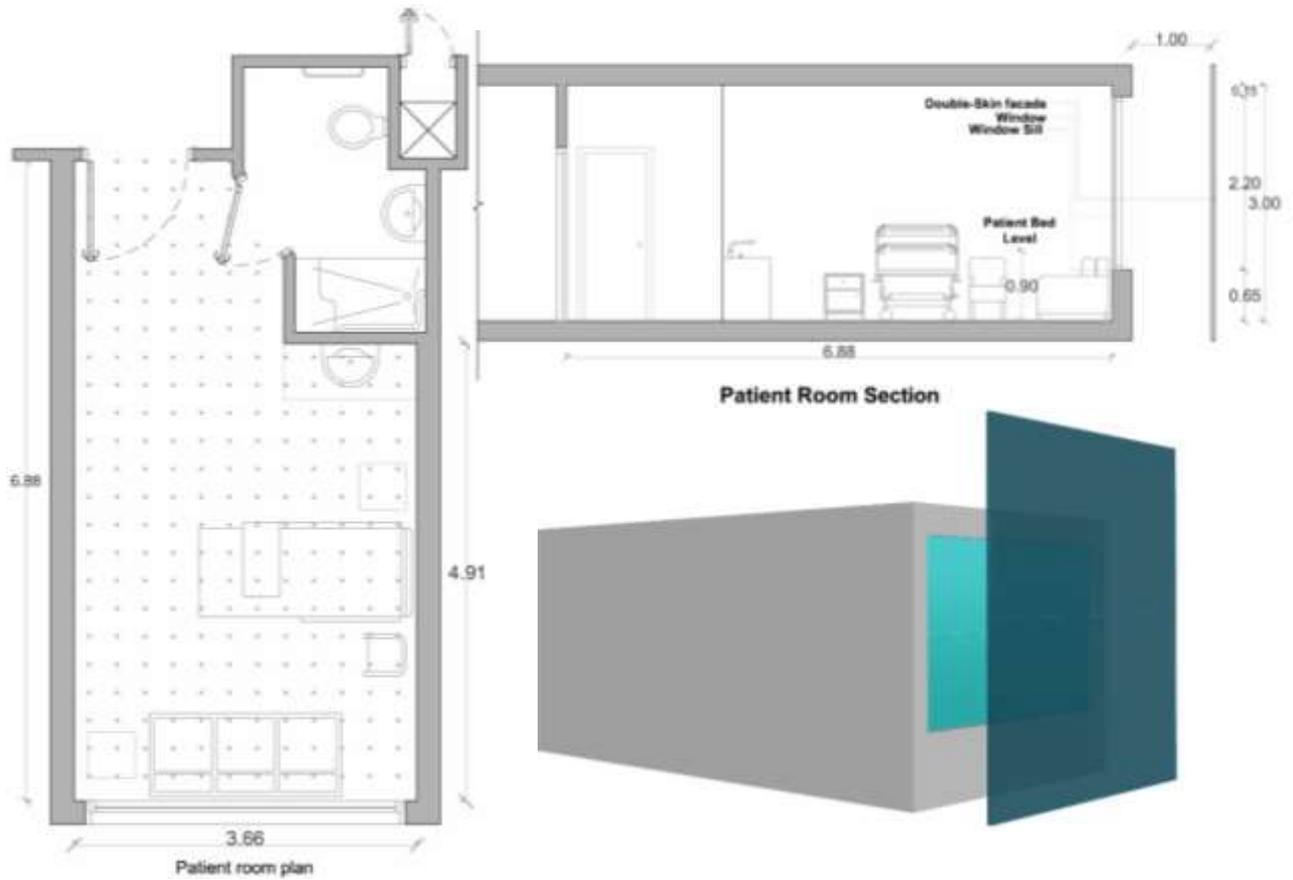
Floor plan, section, and a perspective shot of the tested patient room without DSF daylighting.
